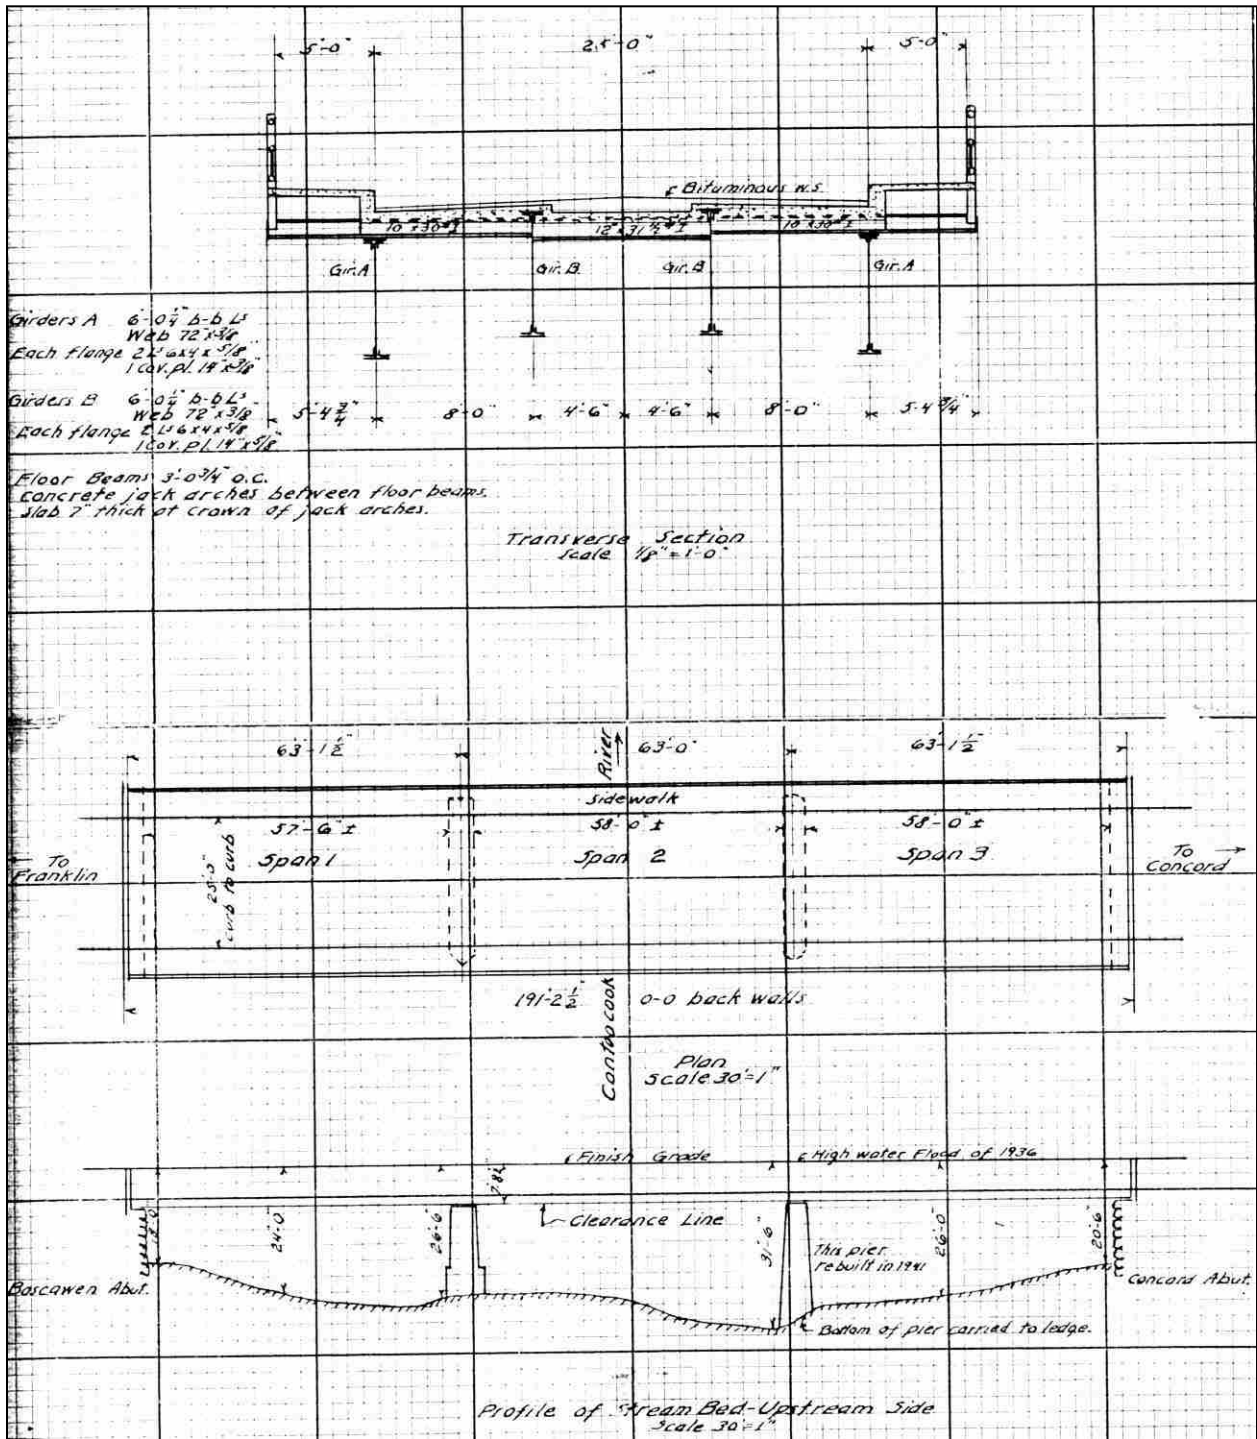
Main Street Bridge Penacook, 1915, a three span deck plate girder bridge. Plan elevation and section sketch made by NHHD engineer Wendell H. Piper, June 12, 1940 (NHDOT bridge card Concord 040/090).
